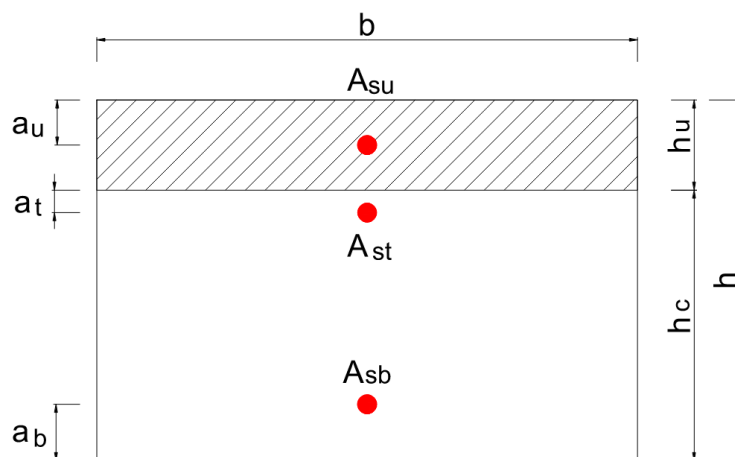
Typical section of normal concrete bridge deck slab with UHPC overlay.
